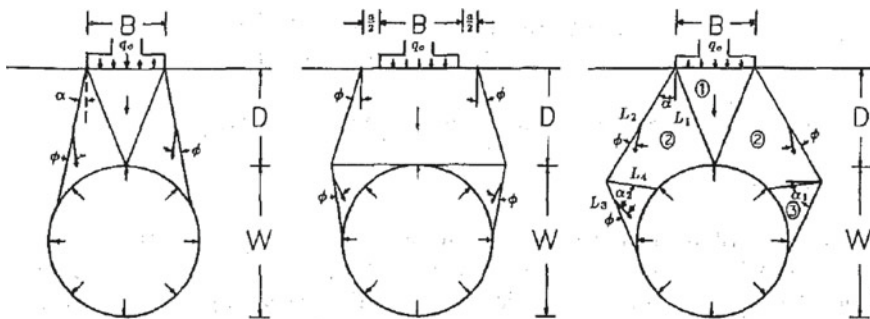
Failure mechanism of footing collapse [10]
